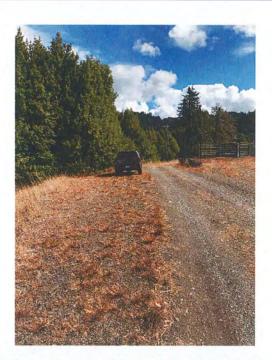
RP 9. Turnout provided for pinch points at RP 9 and RP 10. Vehicle traveling east, photo taken facing east.
